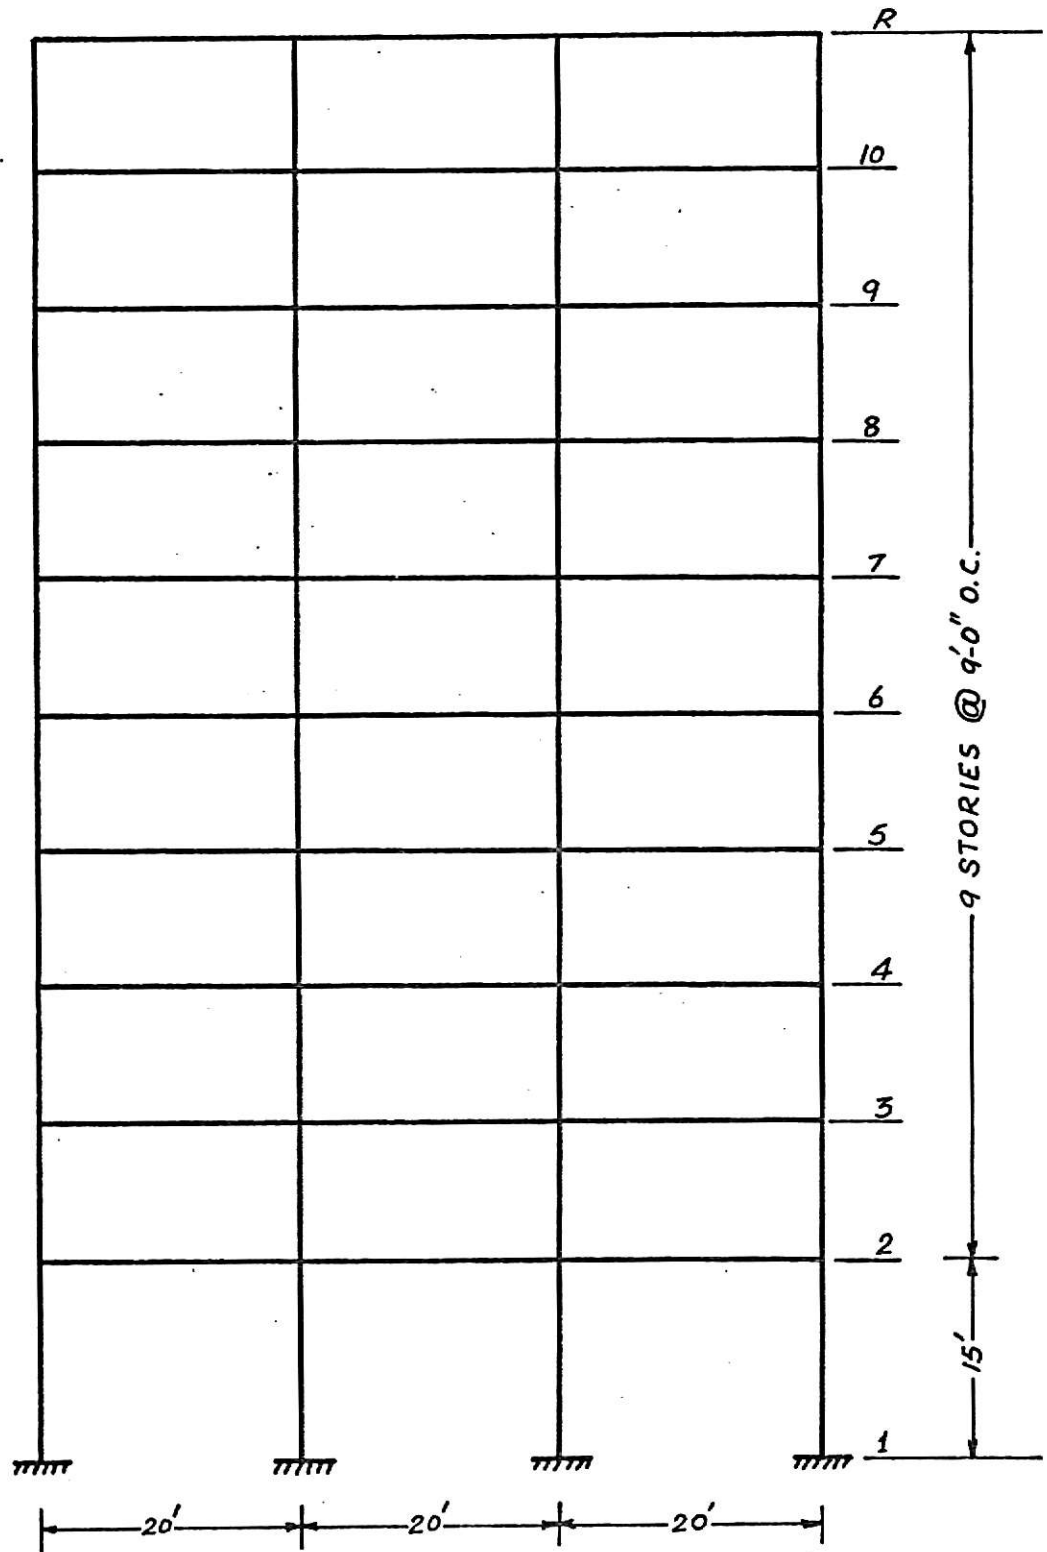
SECTION OF THE 10-STORY FLAT PLATE APARTMENT BUILDING.
